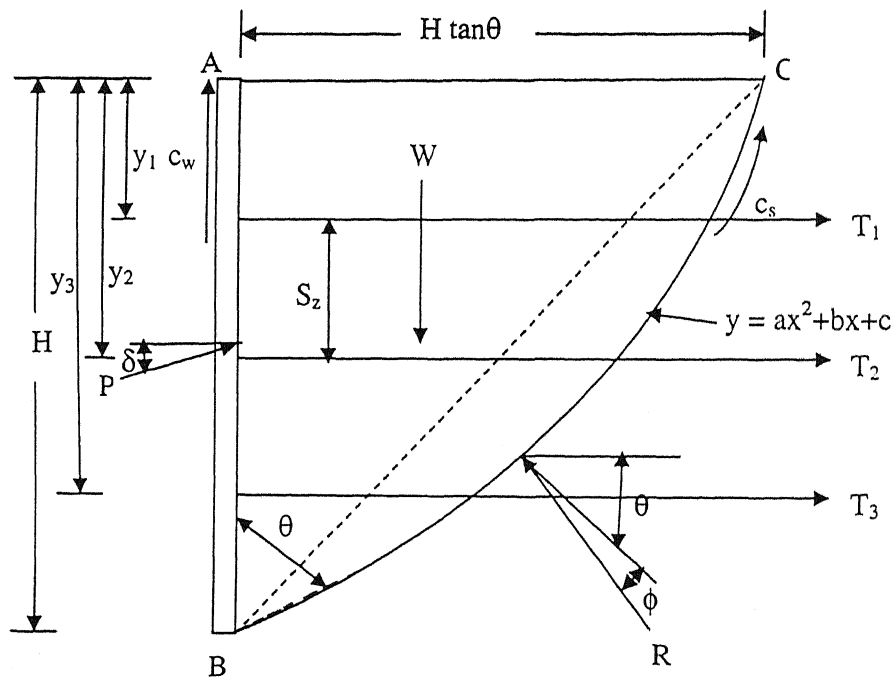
Forces acting on cantilever retaining wall (without loading, reinforced backfill)
